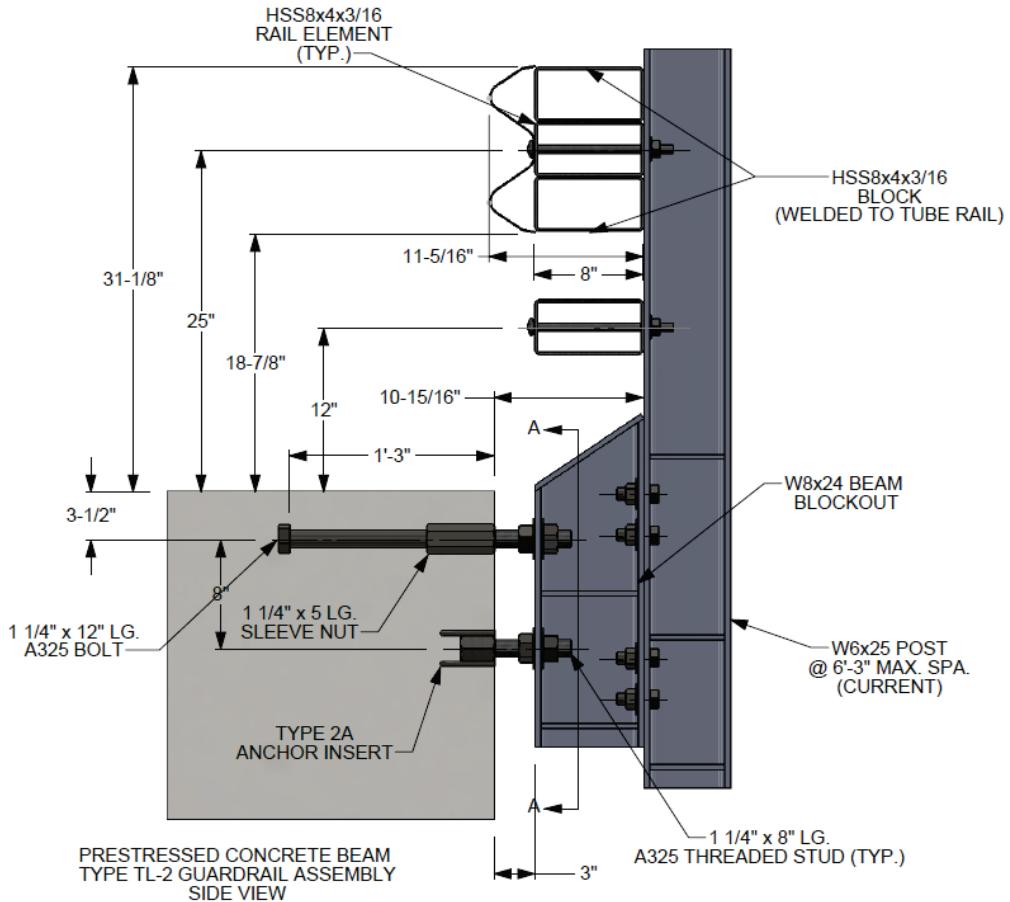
Modified Pre-Stressed Concrete Beam TL-2 Guardrail (6 ft-3 inch Post Spacing) at 31 $\frac{1}{8}$ -inch Height
